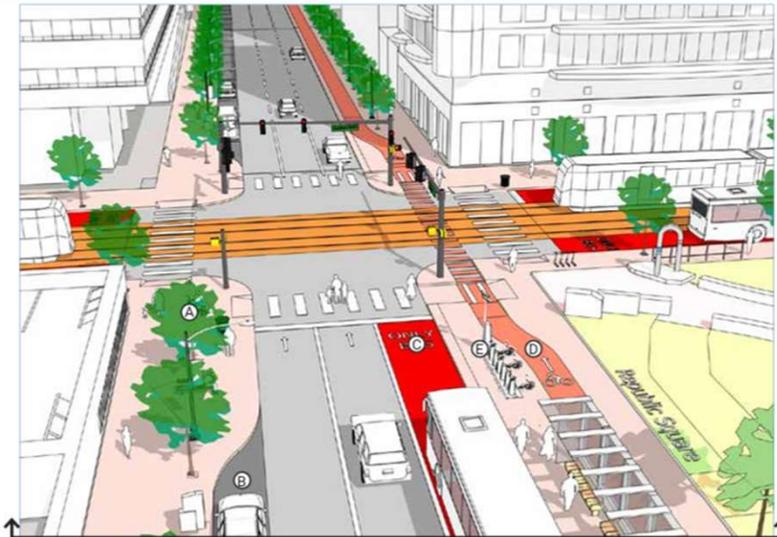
Fifth Street looking east at Guadalupe Street
